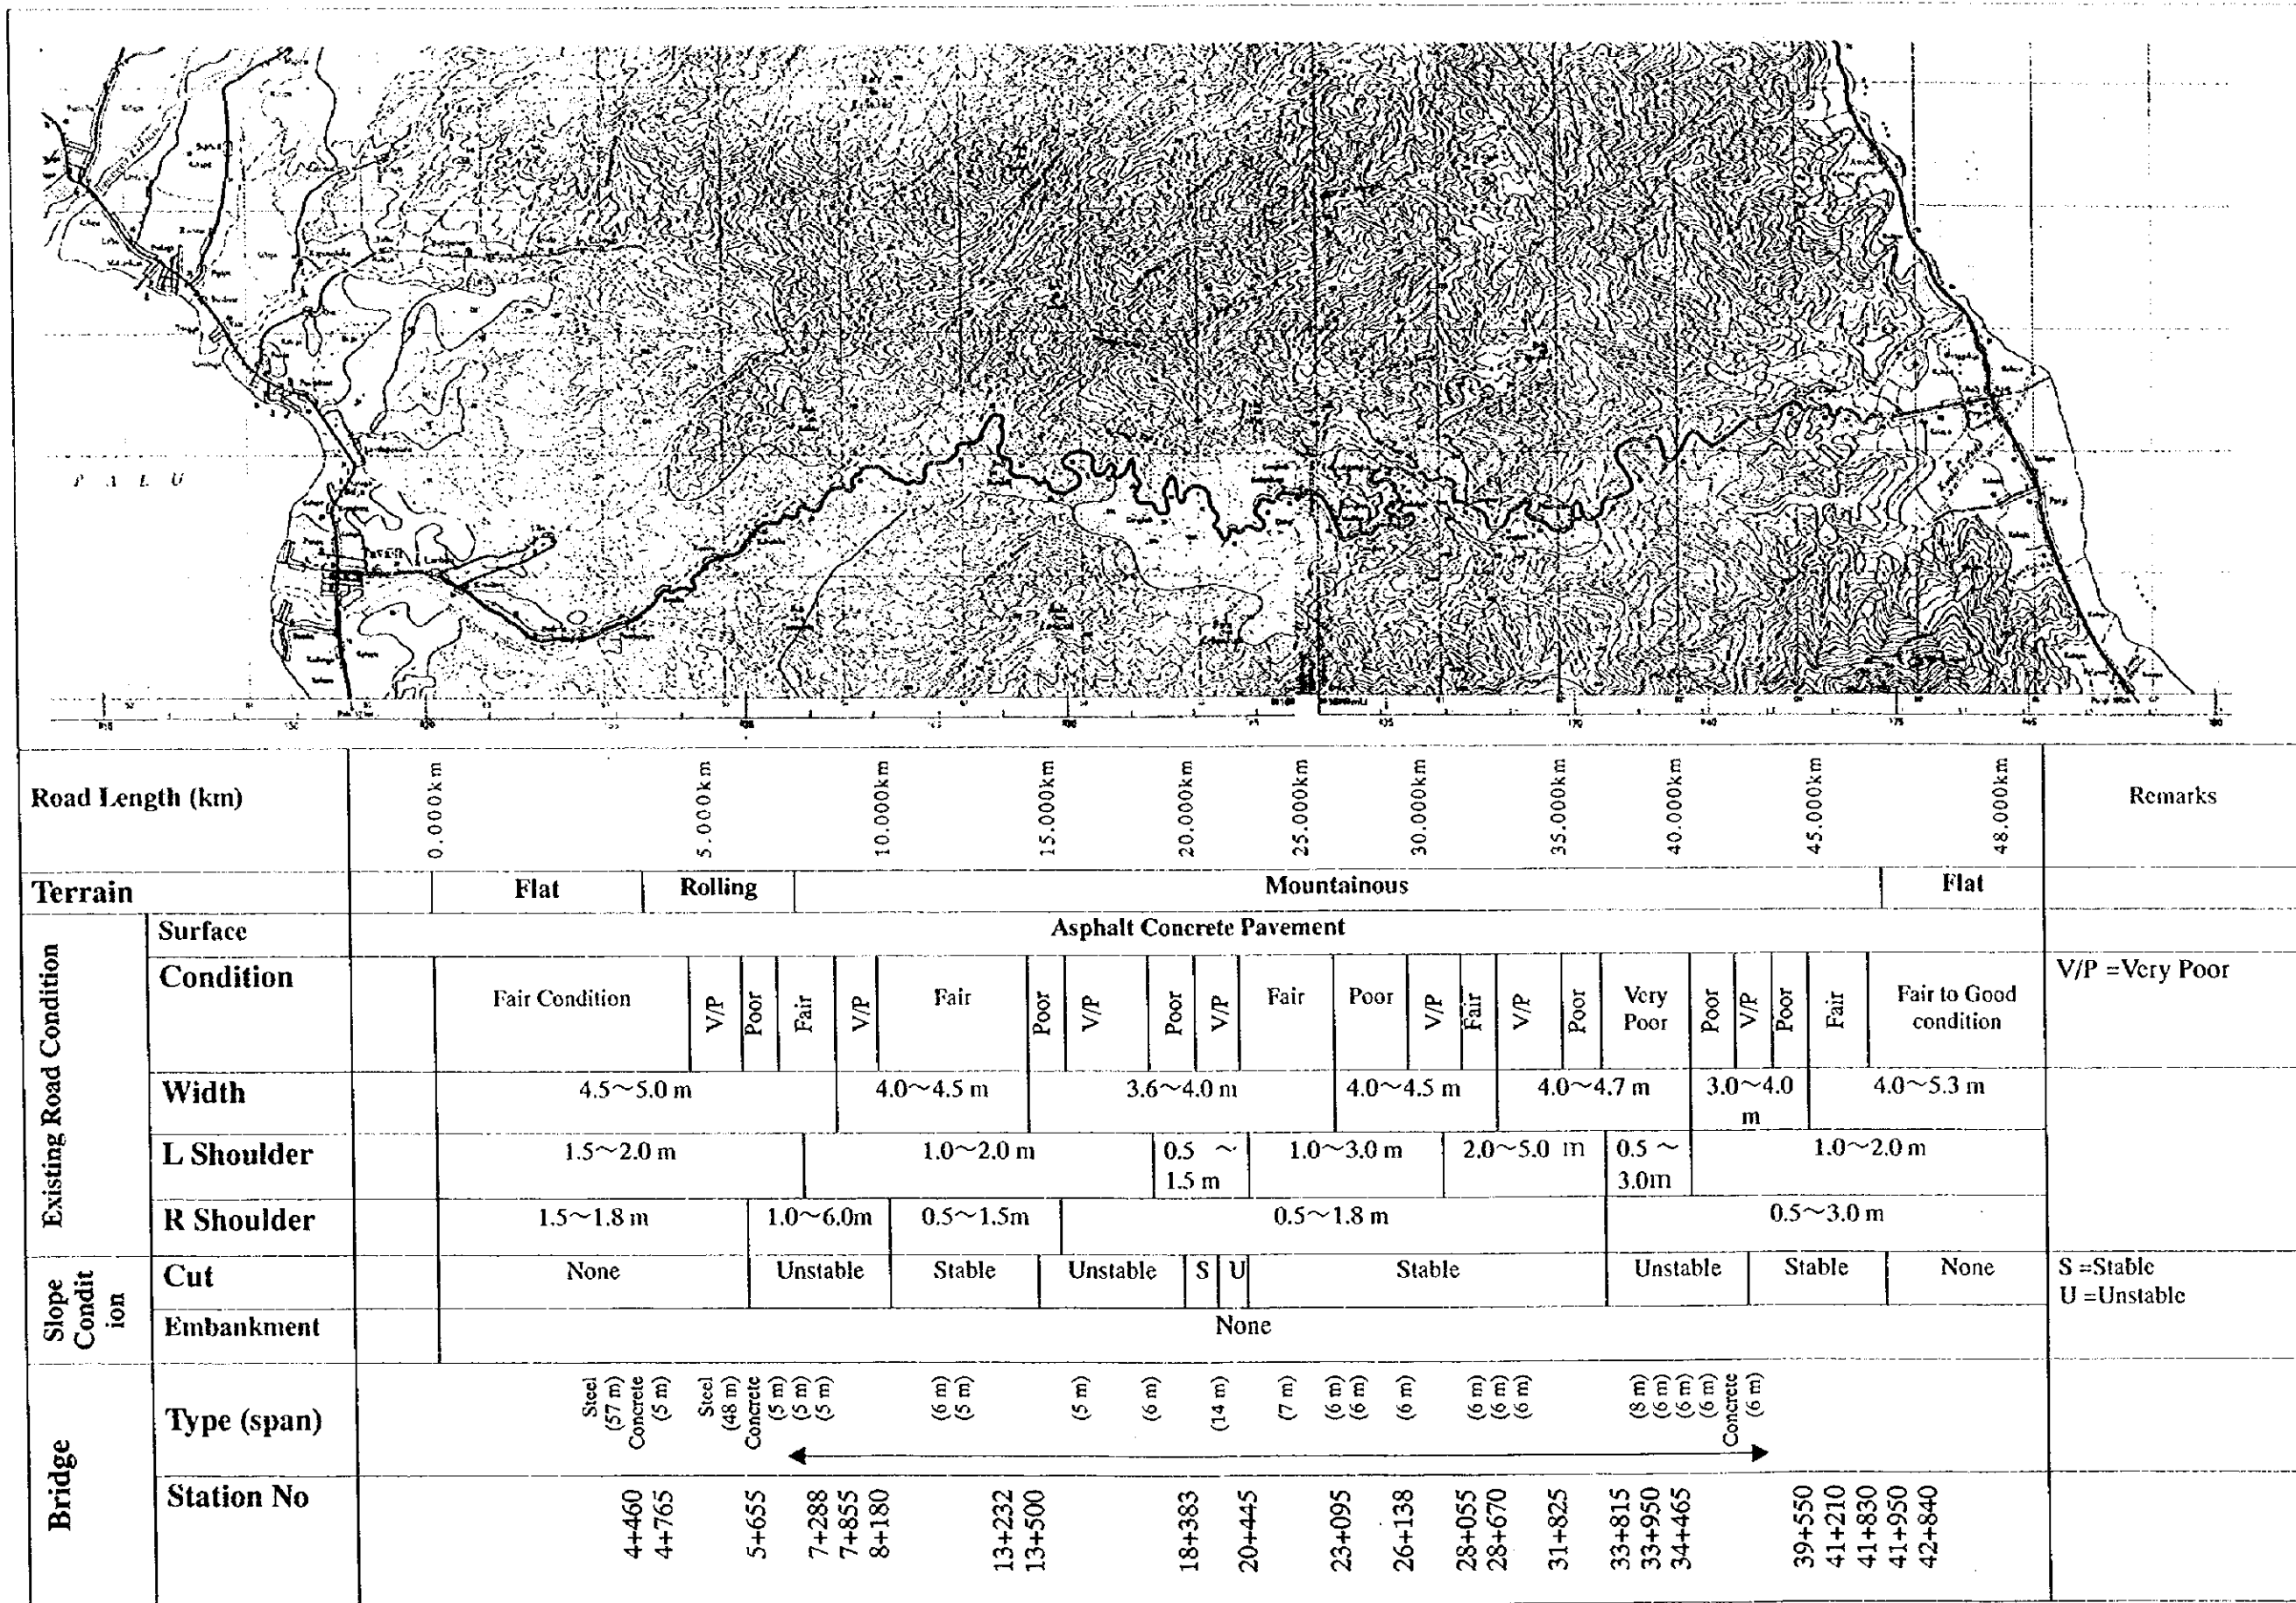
Existing Conditions of Tawaeli-Toboli Road
